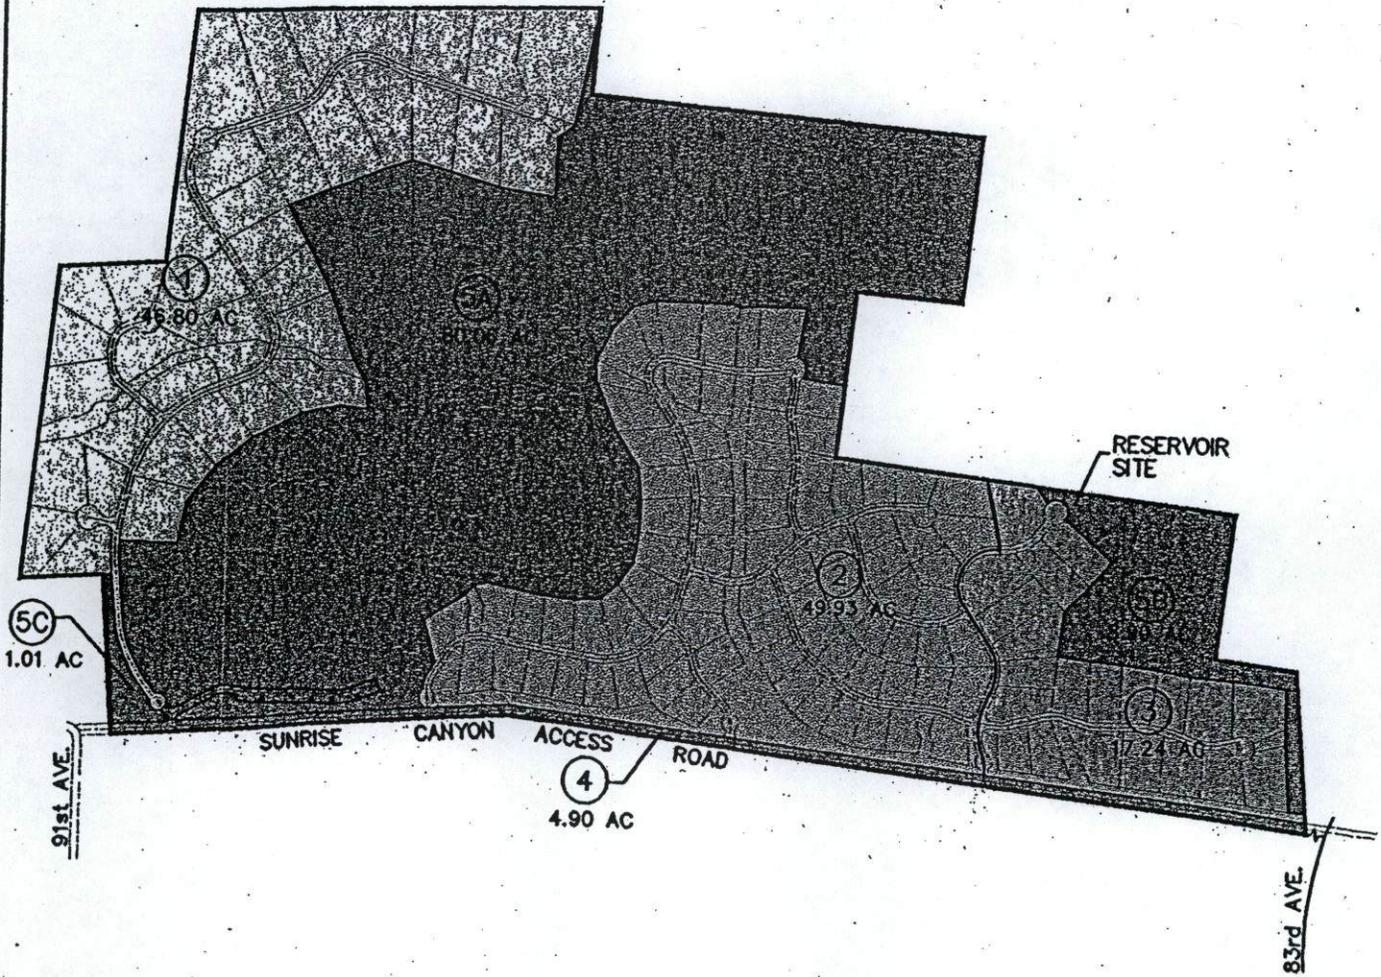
PRELIMINARY DEVELOPMENT PLAN
